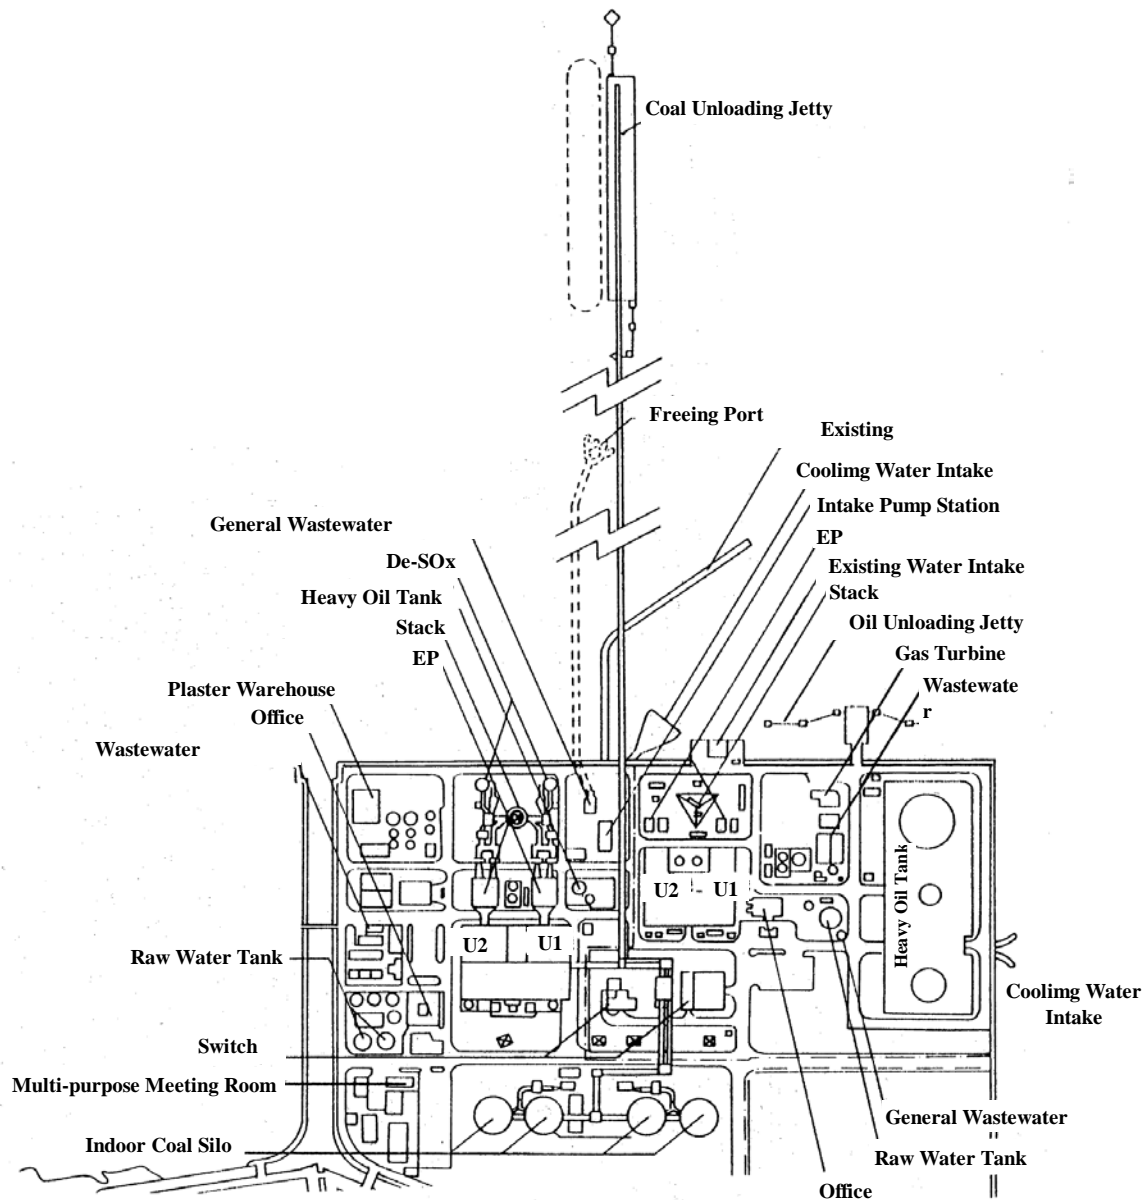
Layout of coal receiving and storage facility (indoor type)
